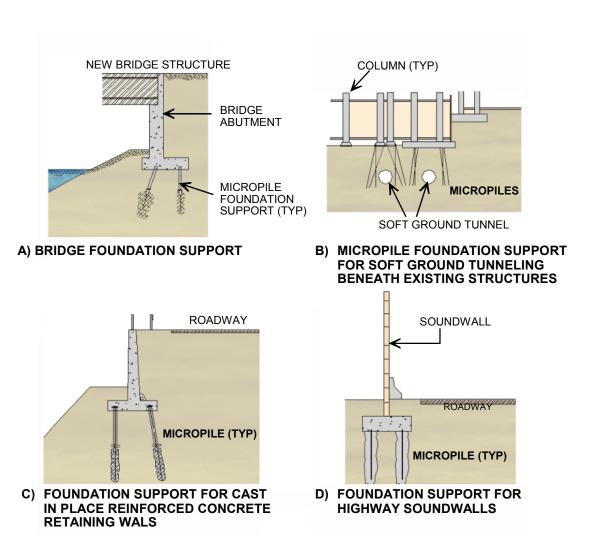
Micropiles for Foundation Support of Transportation Applications Micropiles can be installed through, and bonded within, existing structures, providing direct connection with a competent underlying strata without the need for new pile caps, while at the same time reinforcing the structure internally.
